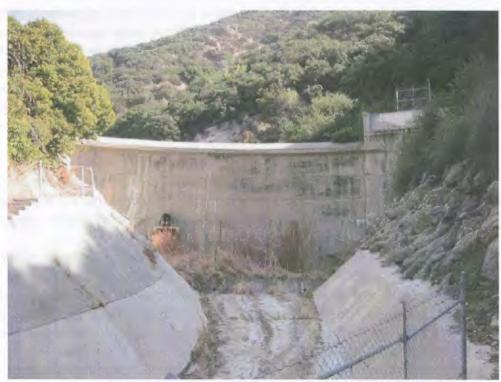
East elevation of the dam from the adjacent service road. The utility shed is visible on the hillside to the north of the dam. View looking west.
